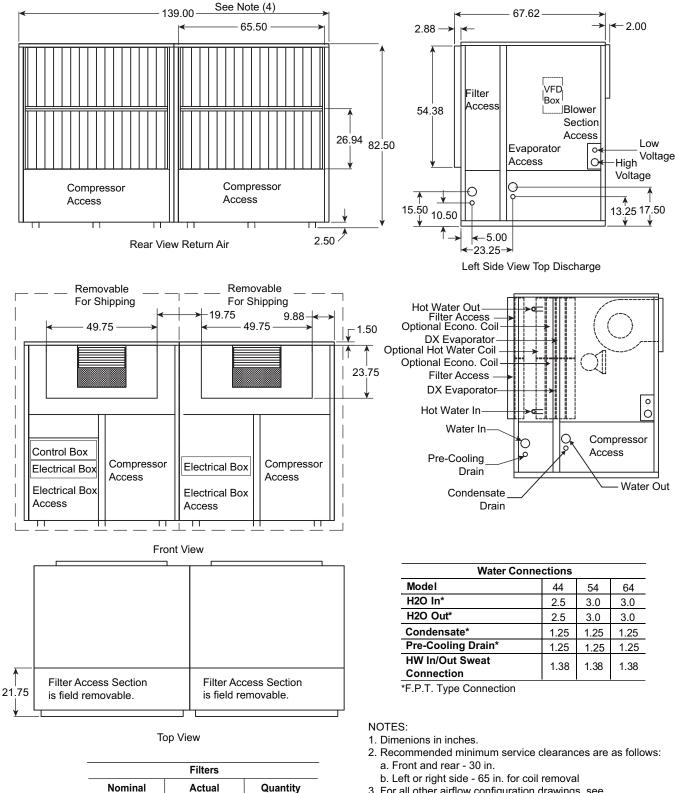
50BVT,W,V 044-064 (High Boy) Dimensions Rear Return, Front Supply with Waterside Economizer and Hot Water Coil
